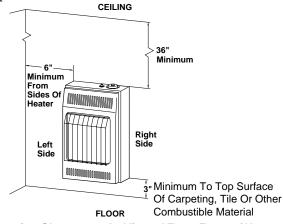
Mounting Clearances As Viewed From Front of Heater
